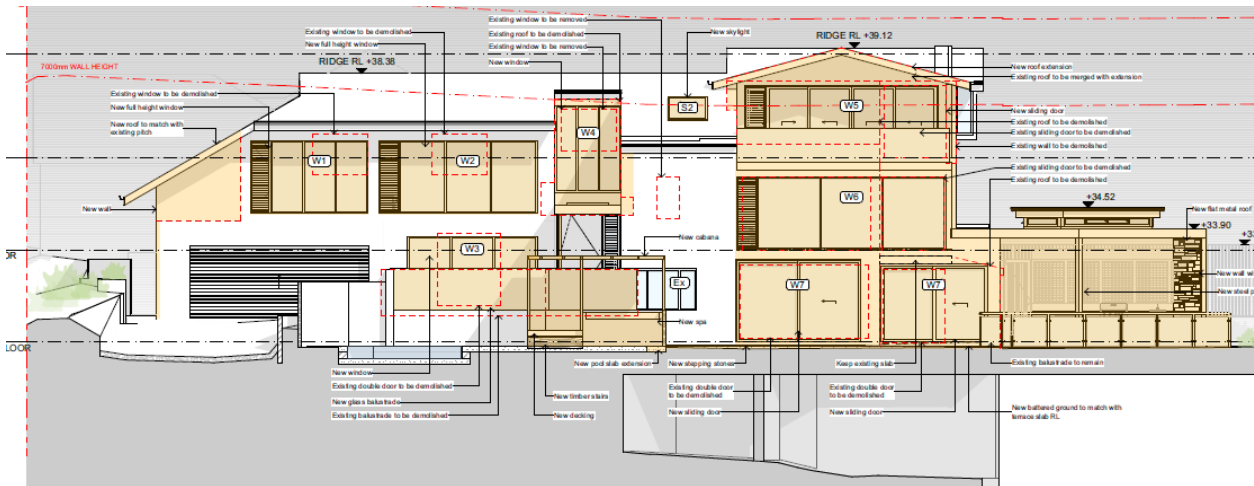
Southern elevation with proposed alterations and addition represented in yellow. (Source: Architectural Plans)
